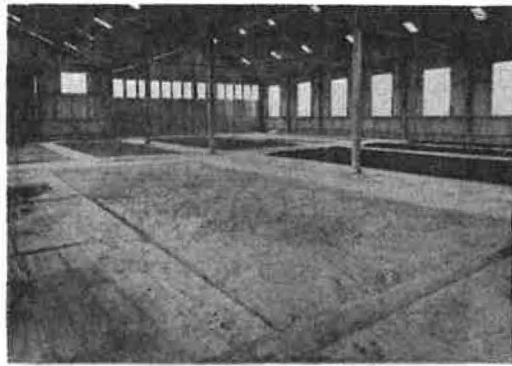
Special building at the Road Research Laboratory for carrying out full-scale tests with the compaction plant.
